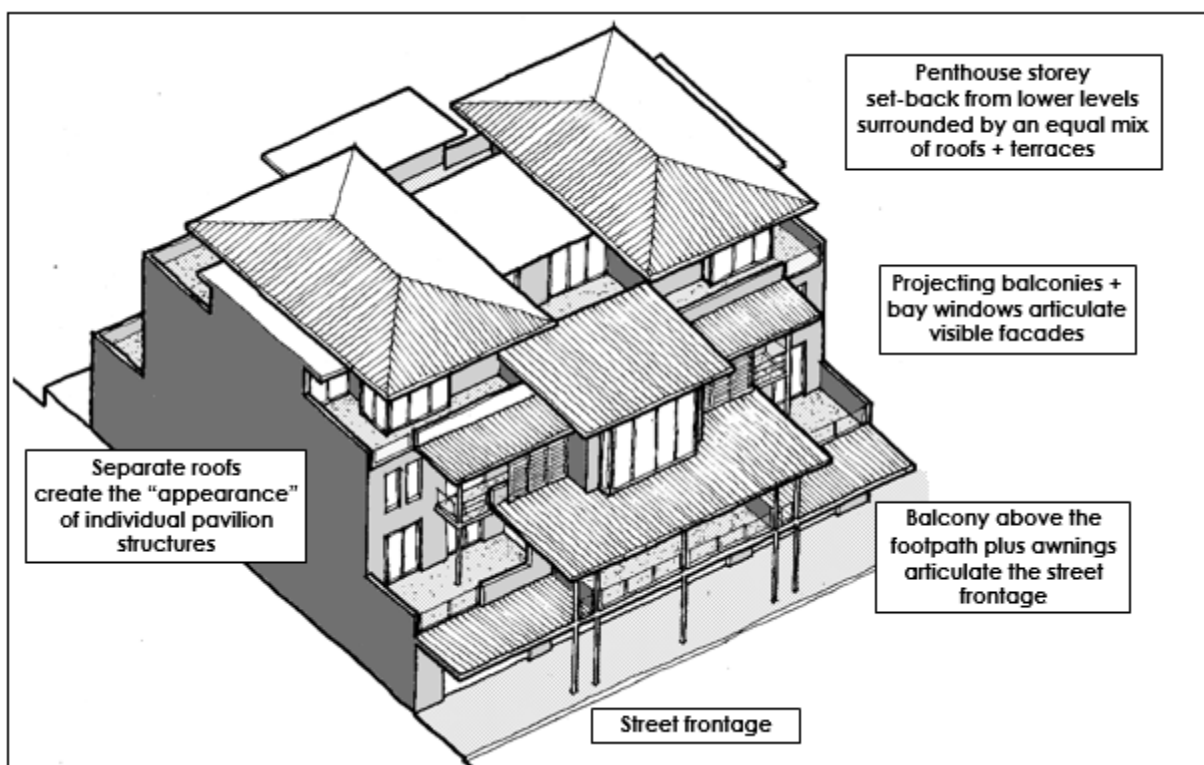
The desired articulation of building forms illustrating steps in plan and cross-section
